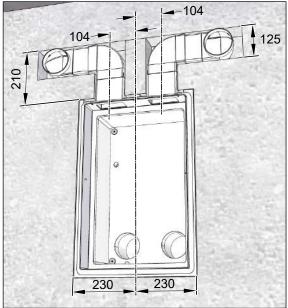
Horizontal flat ductwork layout example, dimensions in millimetres
